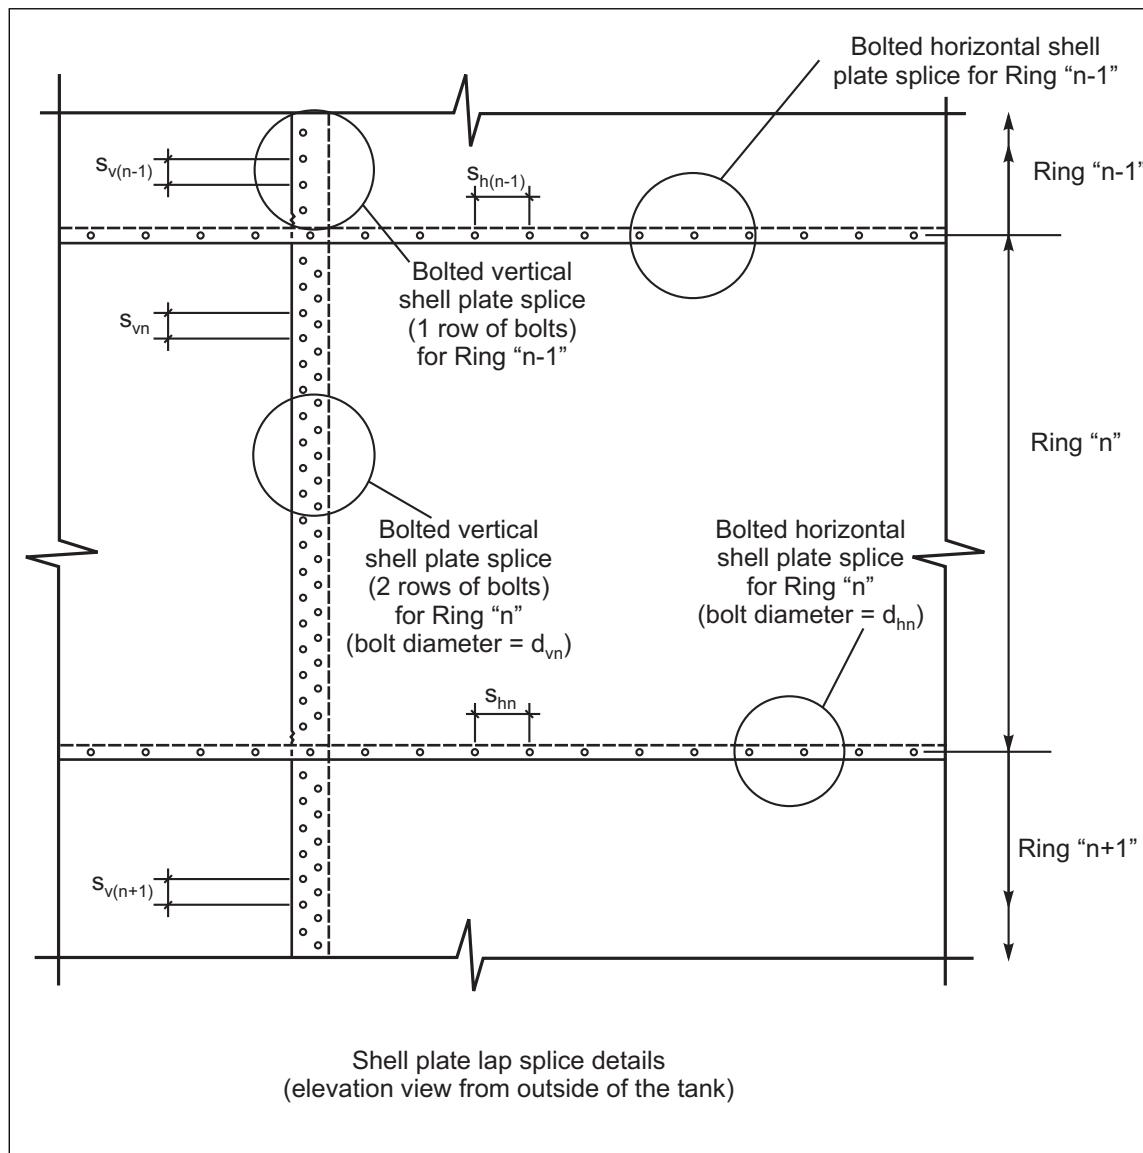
Shell plate lap splice details (elevation view from outside the tank)
